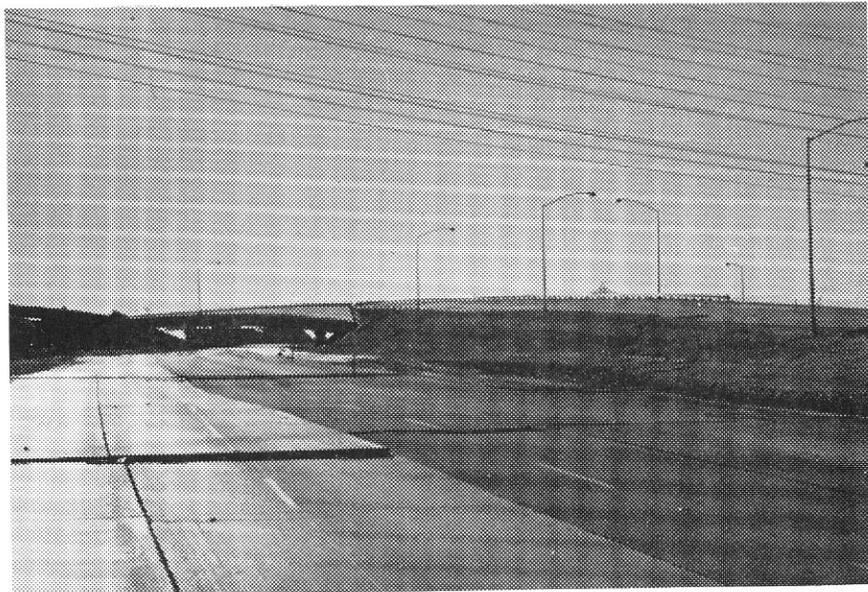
Looking southeasterly at Route 5 northbound truck lanes. Note slab separation, laterally and vertically, at joints. Damaged D-Y Connector Structure is in background.
